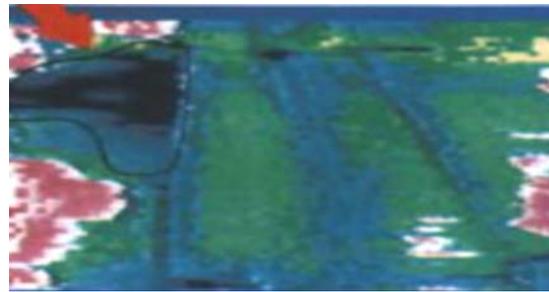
Thermogram showing the leaking drainage pipe (Weil, 1998)
